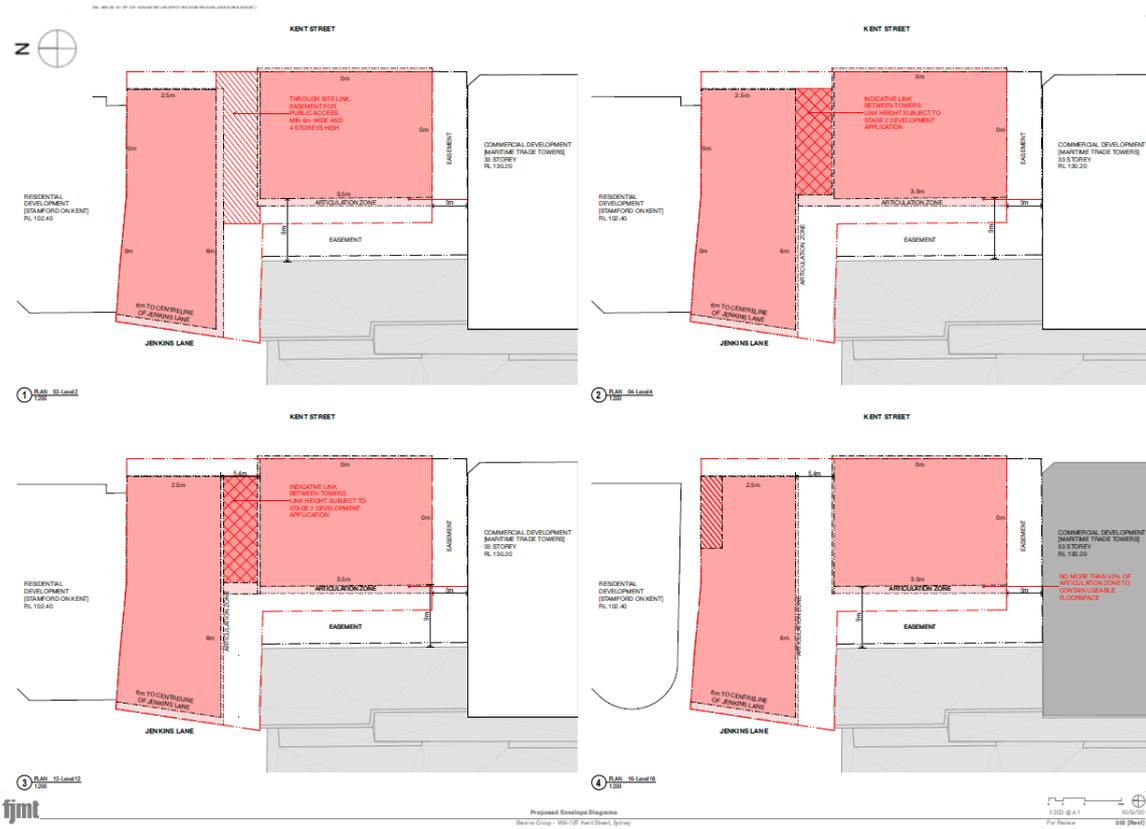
Proposed envelope plan diagrams, including floor levels 2, 4, 12 and 16
